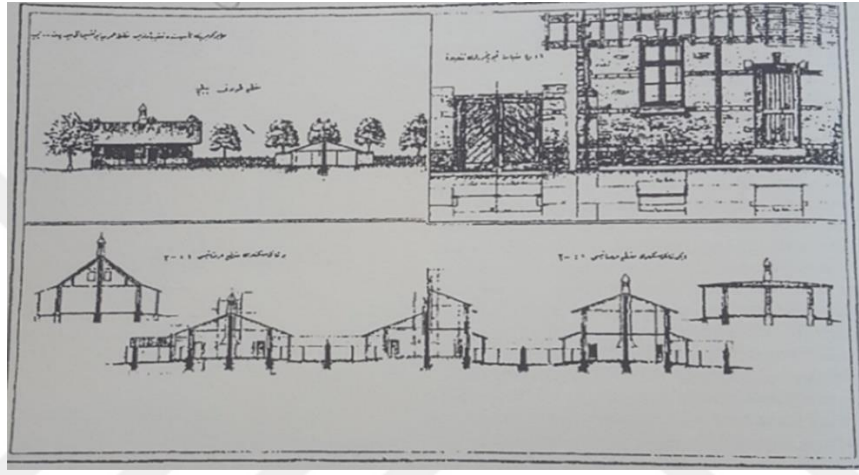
4. 1917 Sample Refugee Village; *one construction, details of door and window and sections.*⁸¹
